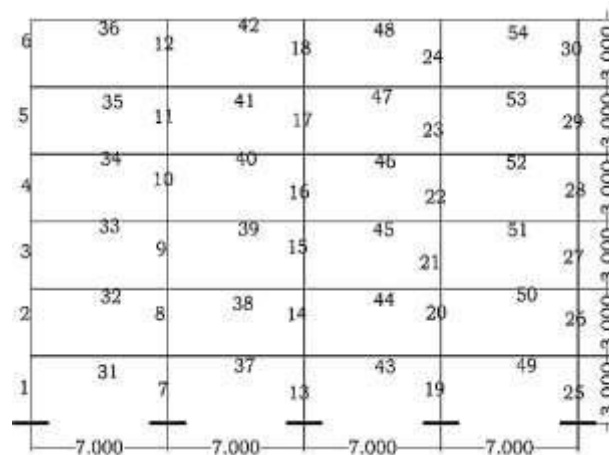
Elevation of 6-storey steel MRF 6 & 9 floors each 3.00m and four bays each 7.00m respectively
